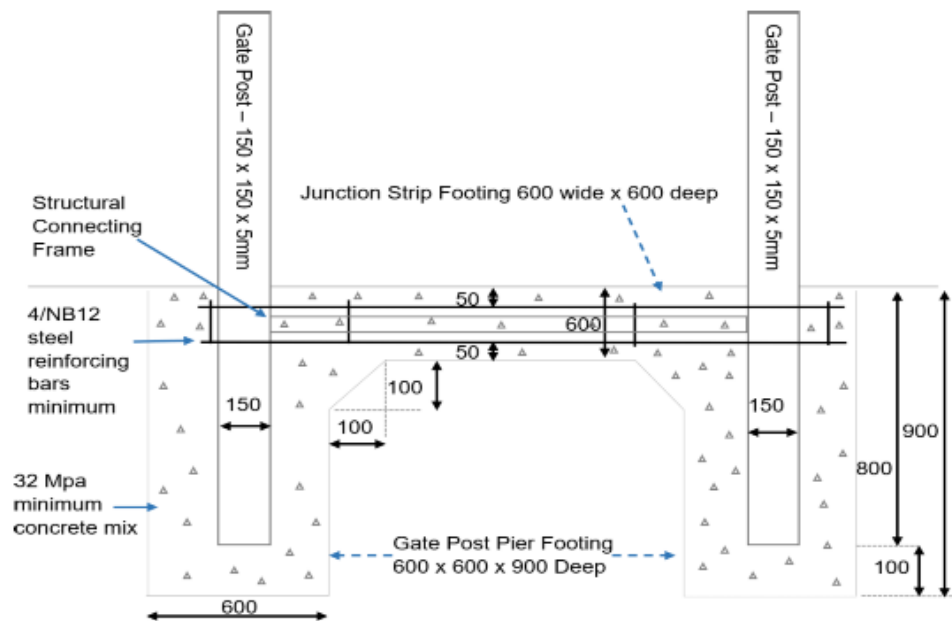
Indicative plan for Pedestrian Entrance Electric Strike Release Gate (G3) showing proposed footing dimensions. (Source: SINSW)
